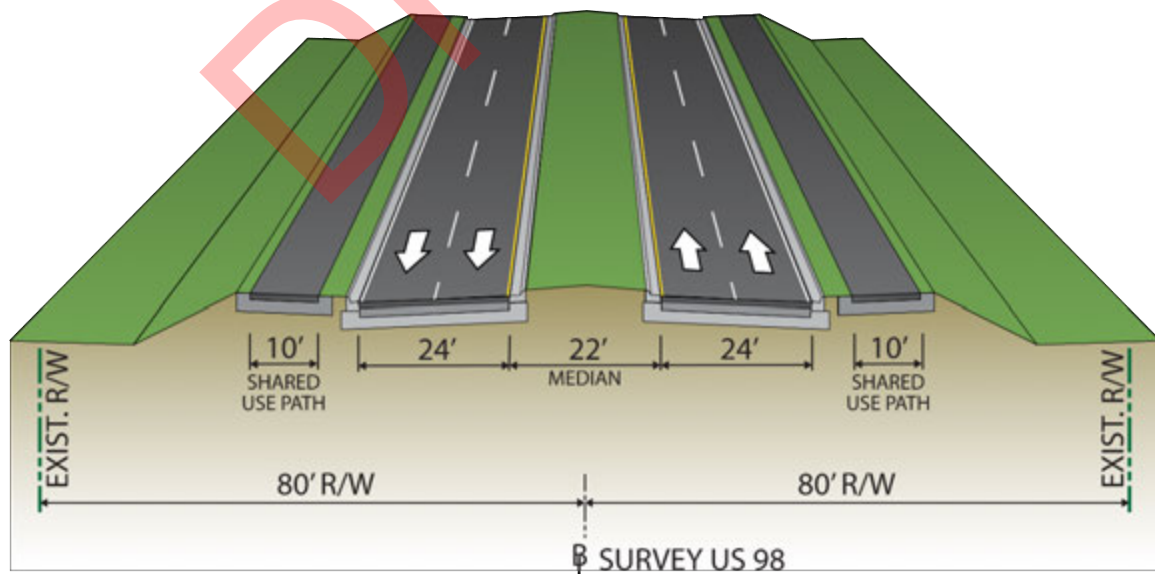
Proposed US 98 C3R (Suburban) Typical Section
